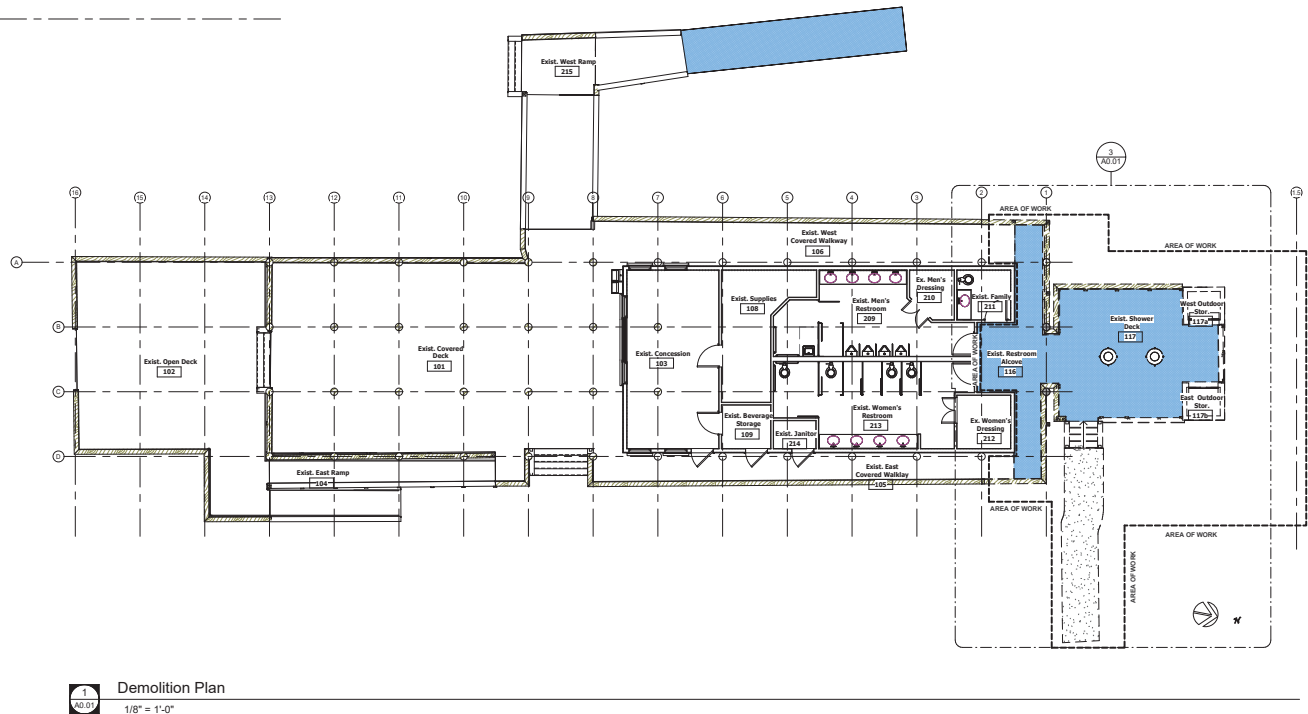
EXHIBIT A - Lowdermilk Facility Improvement Drawings S & S
